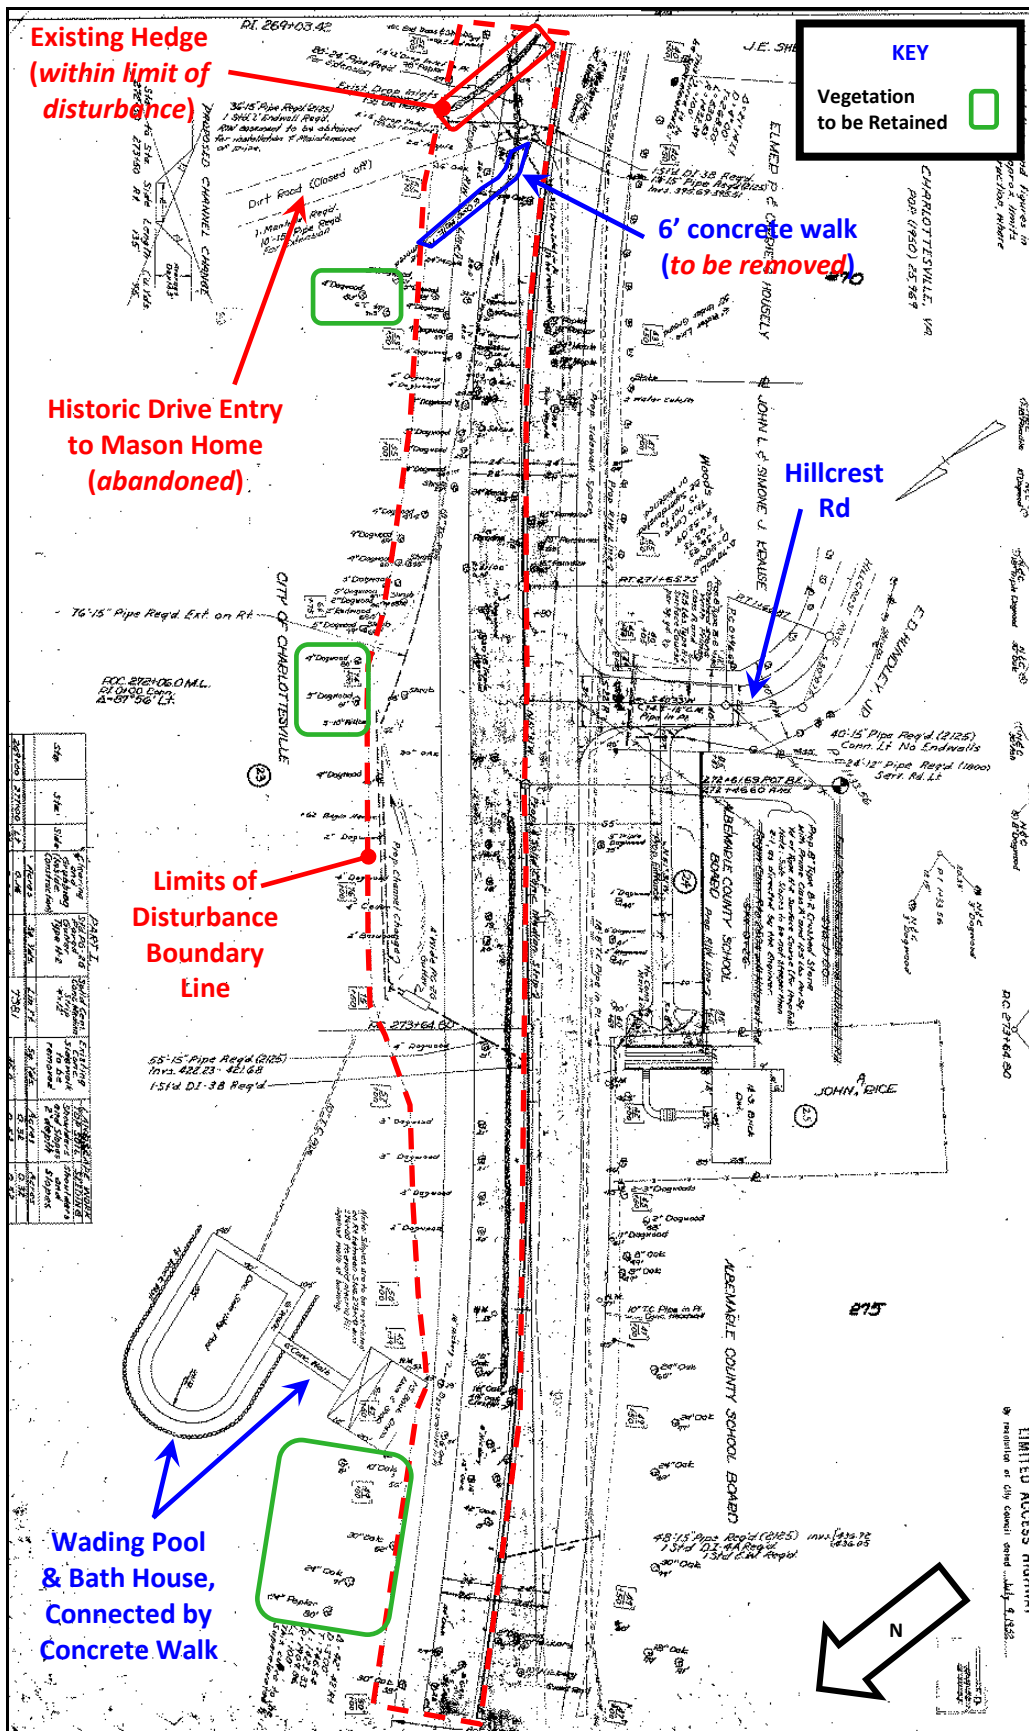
1957 Virginia State Highway Map Showing Existing Conditions and Proposed Work Along Rugby Avenue in Connection with Route 250 Bypass Construction (State Highway, Sheet 9 of 16).
